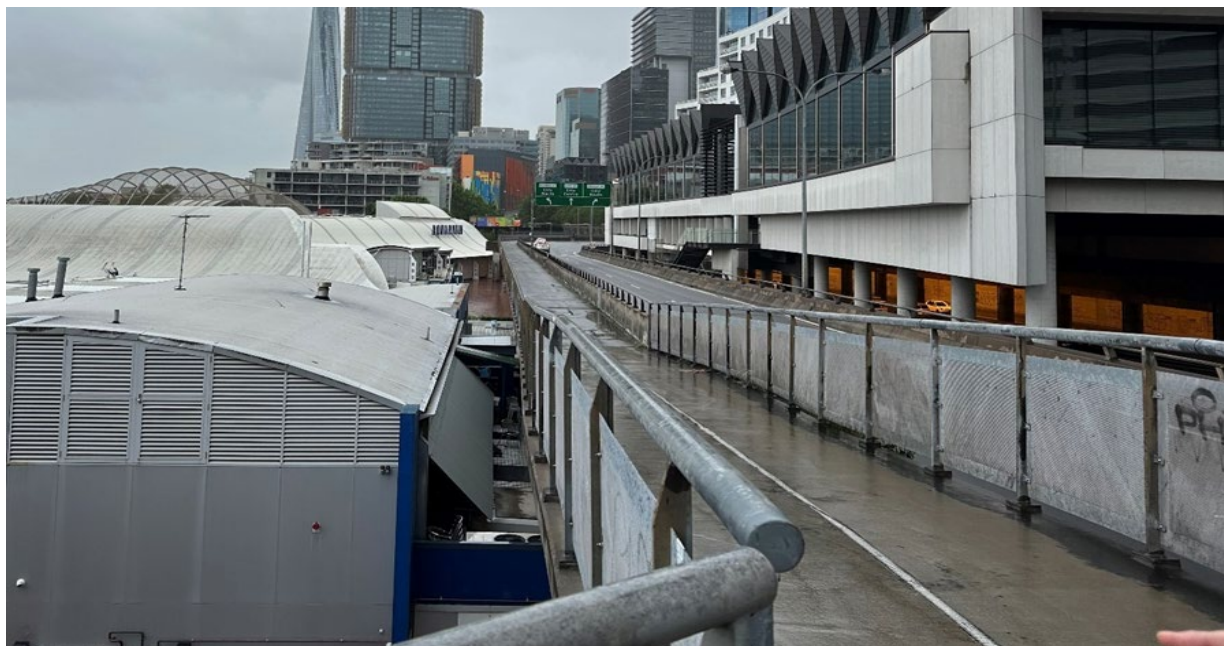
Pyrmont Bridge – Cycleway Bridge (looking north)
